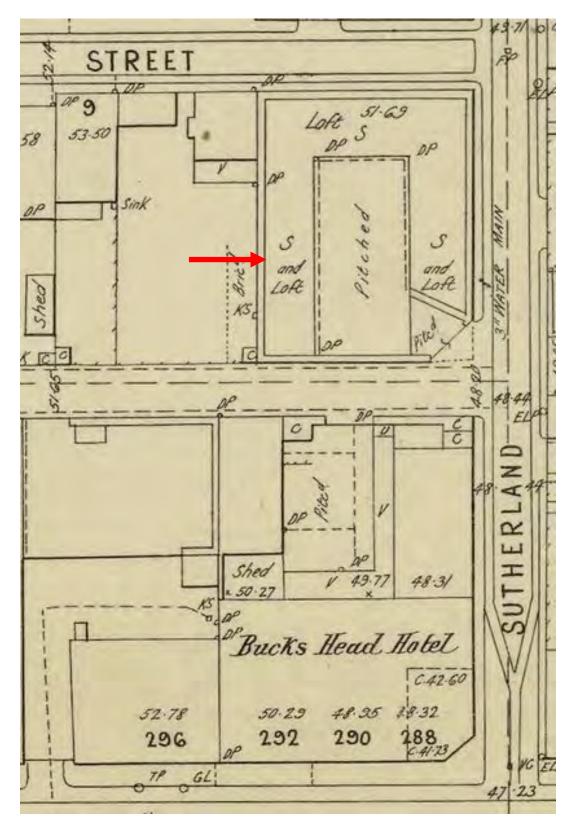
MMBW detail plan 1017, 1894, with Bucks Head Hotel at bottom and the stables to the north (indicated); note the central pitched yard and the U-shaped stables and loft building Source: State Library of Victoria
